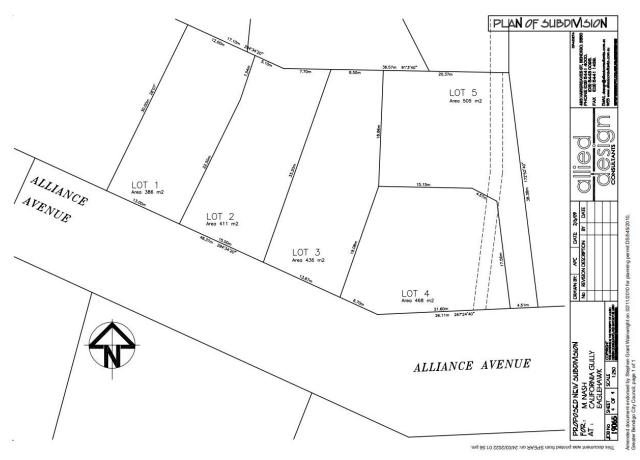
Endorsed plan showing approved layout of five lot subdivision approved by permit DS/545/2010
